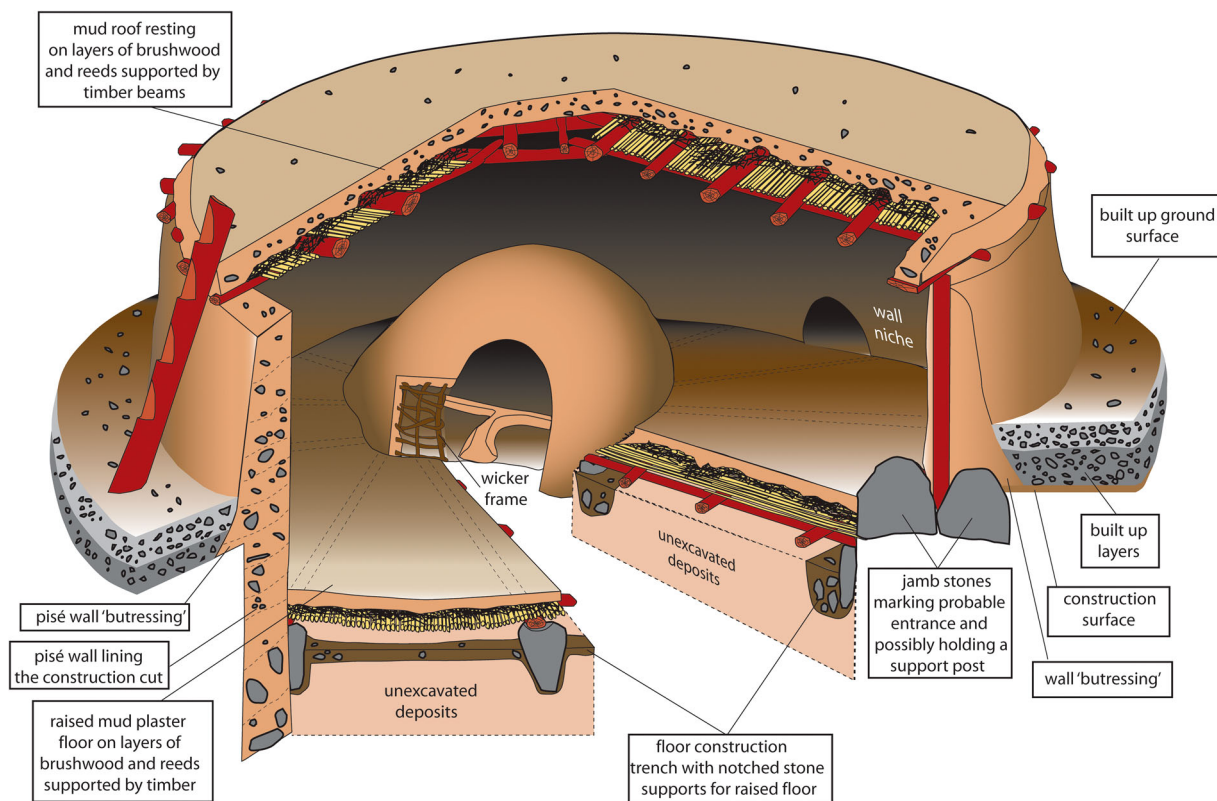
Reconstruction drawing of Structure O45 (drawing: D. Maričević).
